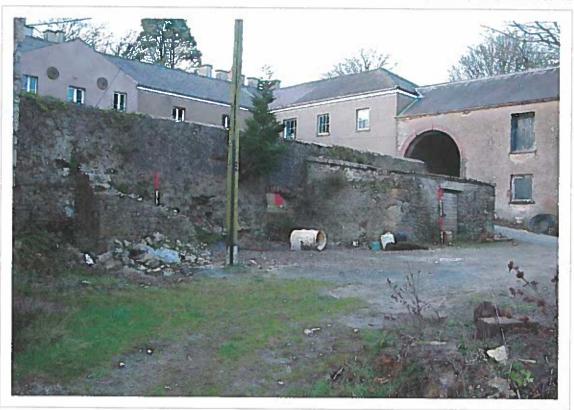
General view of west wing of stable block, showing location of Wall A and Buildings B and C, looking south-west. Scale 2m
